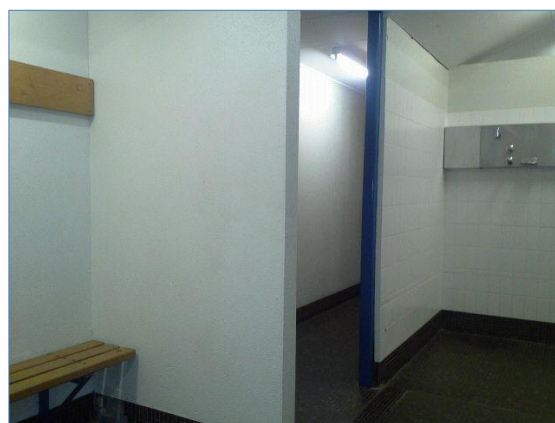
Level 03 Terrace 3.21 - Fibre cement wall panelling
